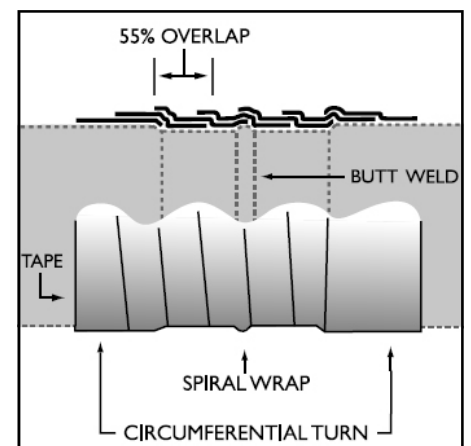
◀. Butt weld and existing coating ready for over wrapping with tape. Note cutback of coating can be 75 mm - 150 mm either side of the weld except on FBE coated pipe.
